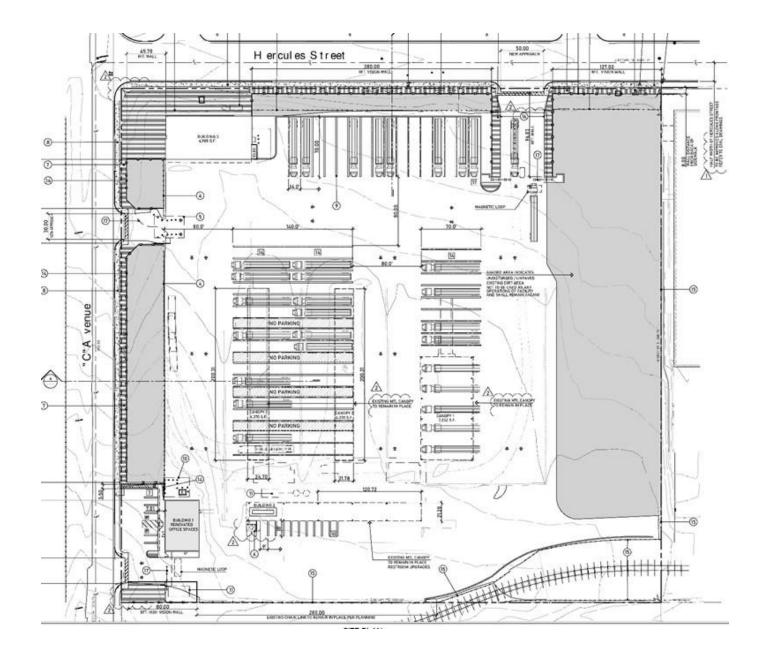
SITE PLAN OF PROJECT SITE Source: Design Development Inc This page has been intentionally left blank.
